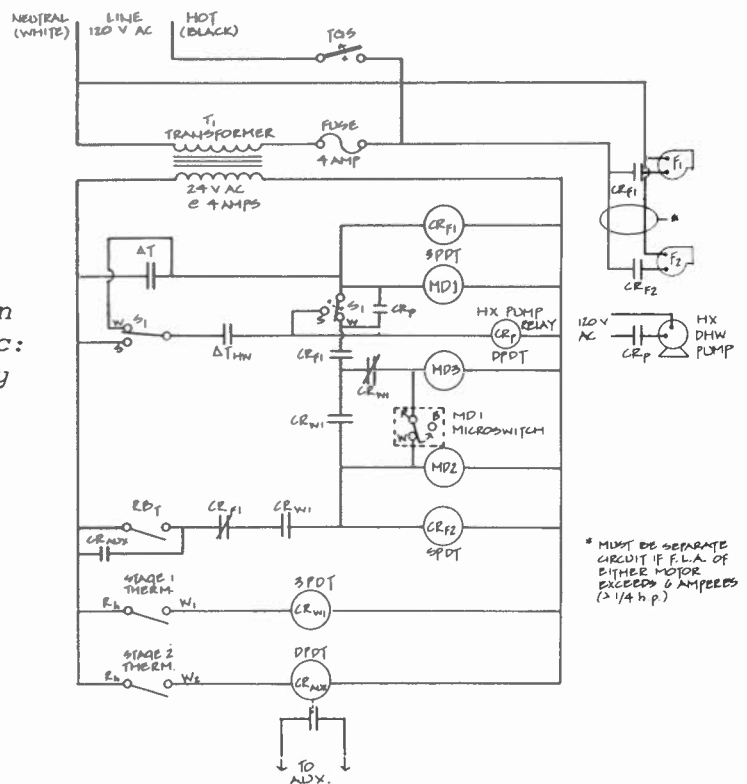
New Construction Wiring Schematic: Series Auxiliary Wall Collector With Storage
